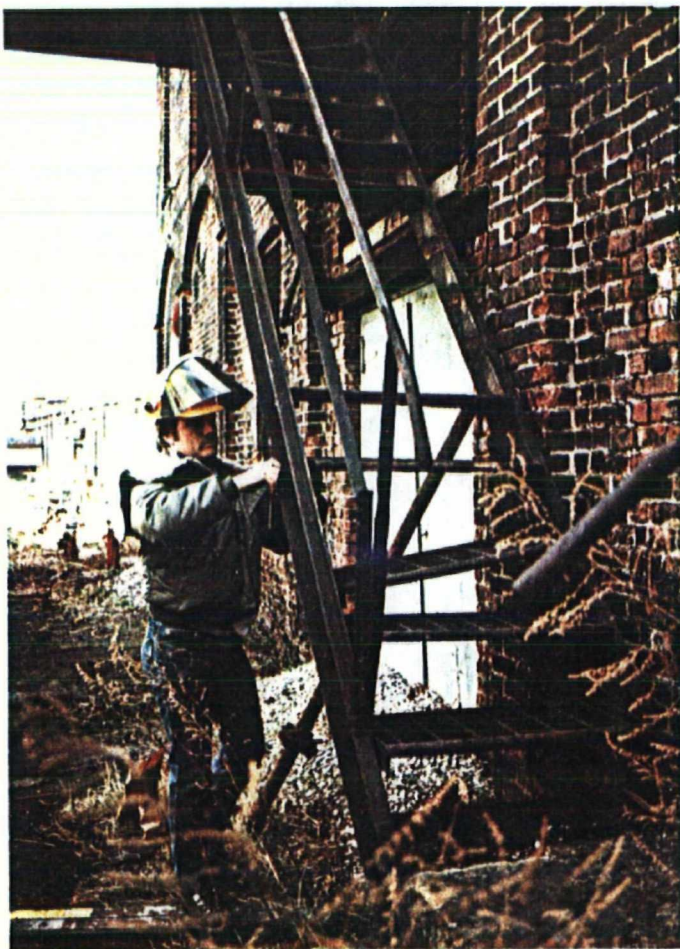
Repairing Stairway to Tank D-13. 4/10/85
